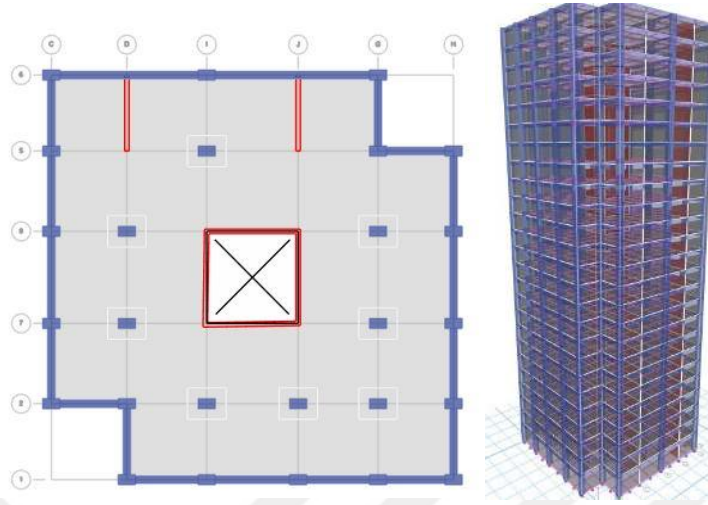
Waffle Floor Model Isometric & Plan View Model (6.3-5.5-5.2).
